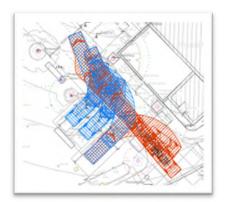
ACM-00-XX-SK-CE-10-0006 Rev C, & 60594179-ACM-00-XX-SK-CE-10-0002 Rev A, Swept path analysis Parking spaces on Market Square.
